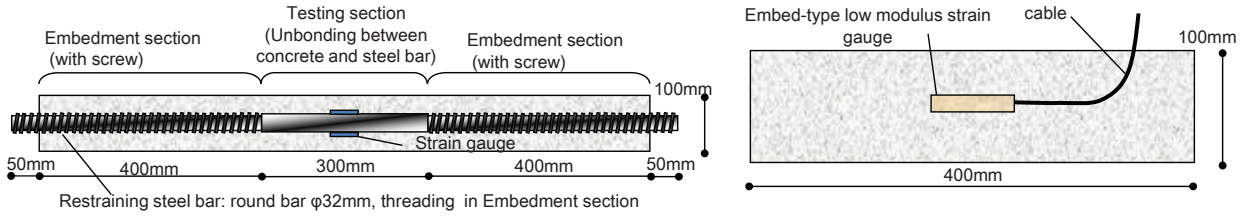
Restrained Cracking Experiment Specimens (Left: restrained cracking specimen, Right: free shrinkage specimen)
